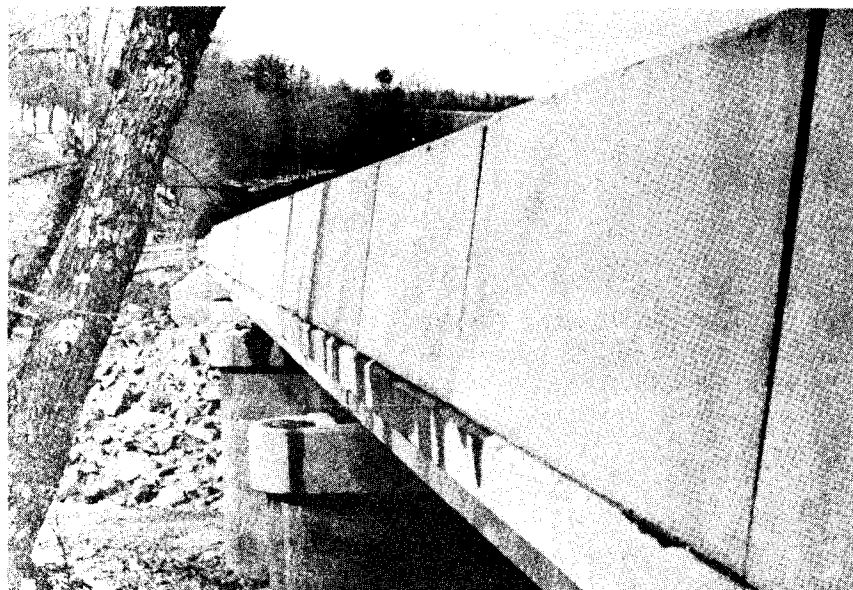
Water draining between precast parapet and exterior tee beam is evidence of poor bond.
